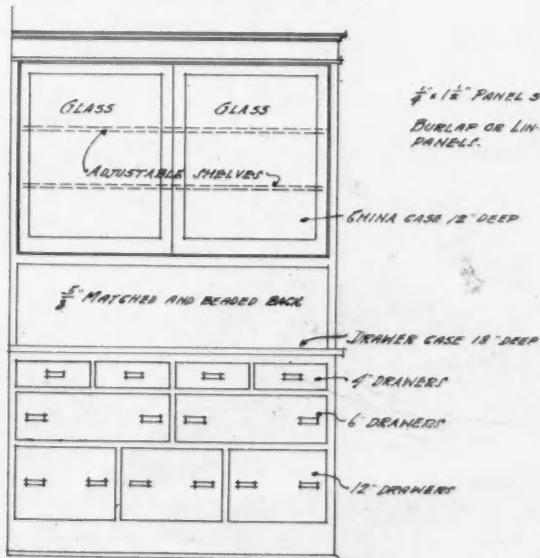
DETAILS OF INTERIOR FINISH, TO SCALE FOR BRICK AND STUCCO RESIDENCE
